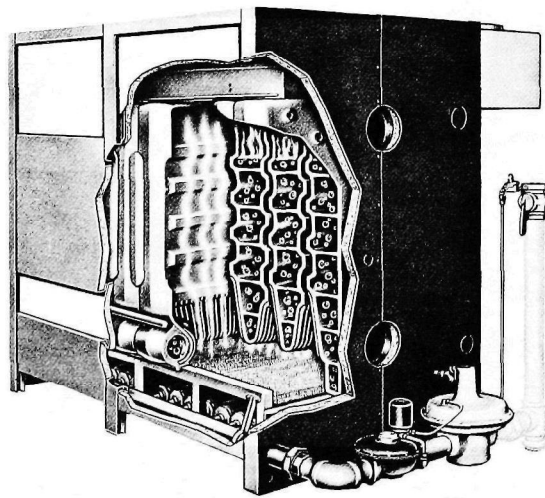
A CAST IRON SECTIONAL BOILER (CRANE CO.,
